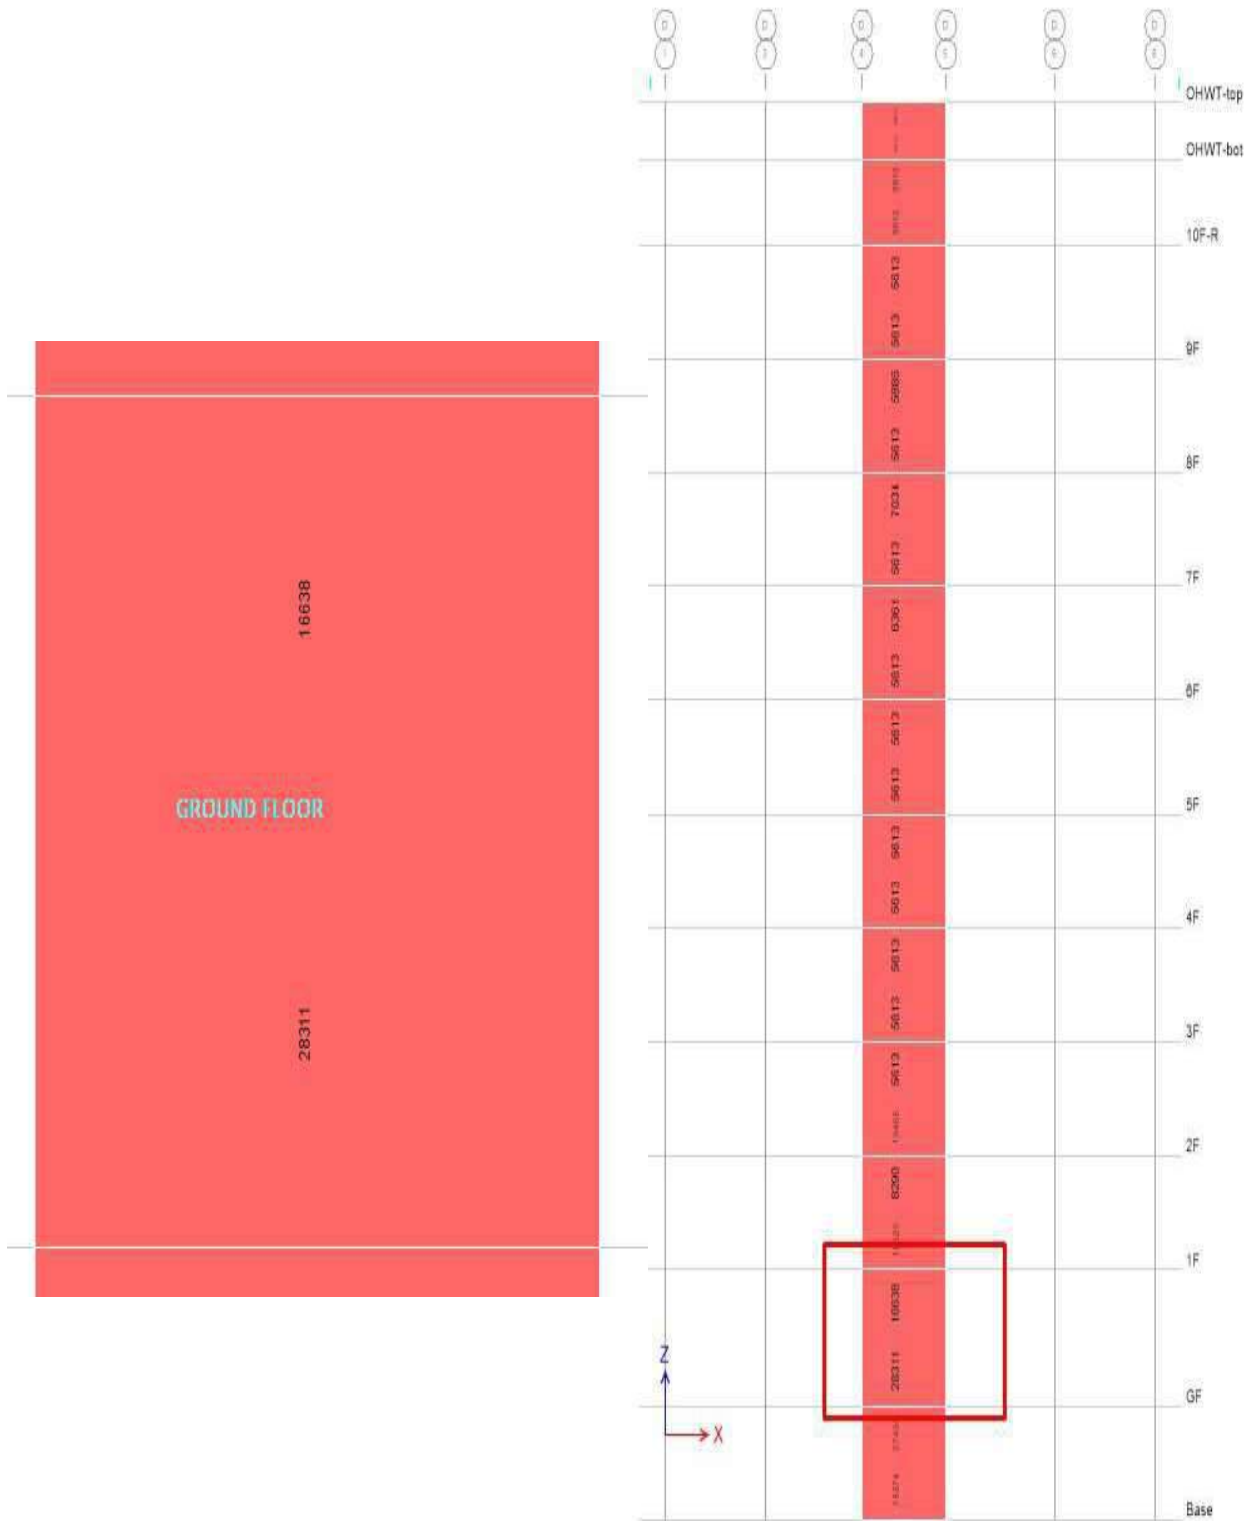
Reinforcement of Lift Wall in Grid D (mm²)
